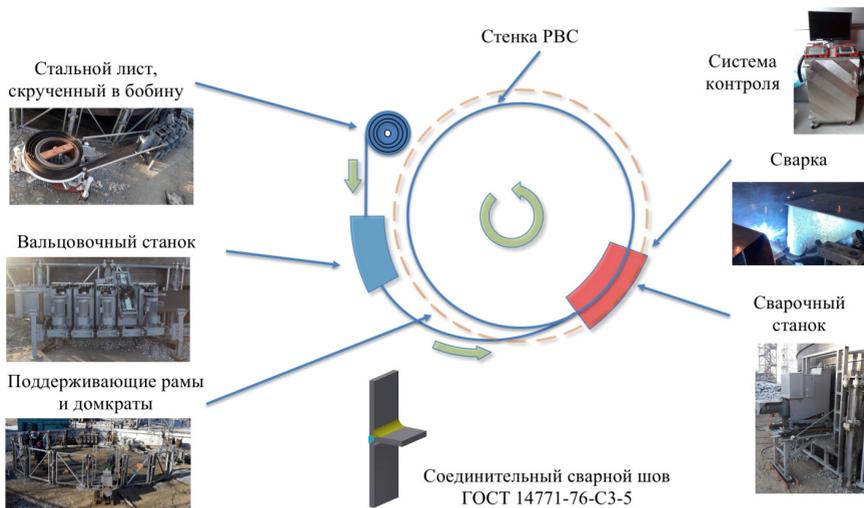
Spiral-wound welded VST construction scheme
